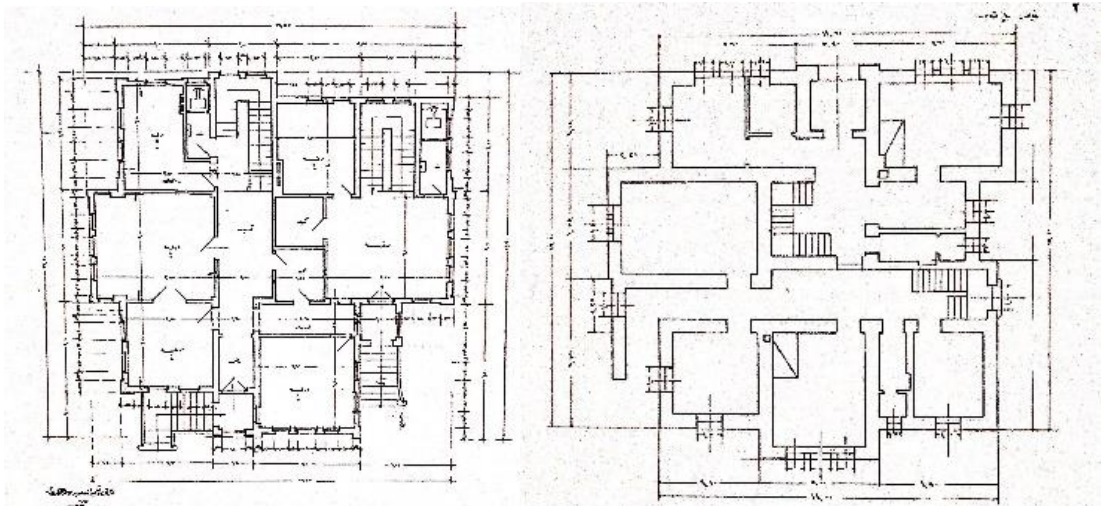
b: The ground and first floor plans of the twin-type Pious Houses.
